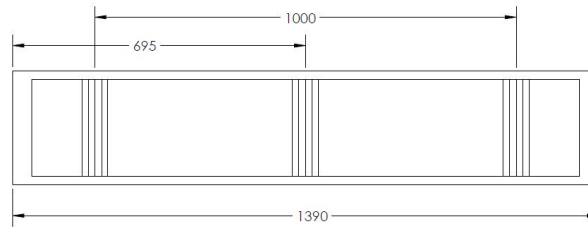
Dimensional details of specimen PS2W1 & PS2W2
